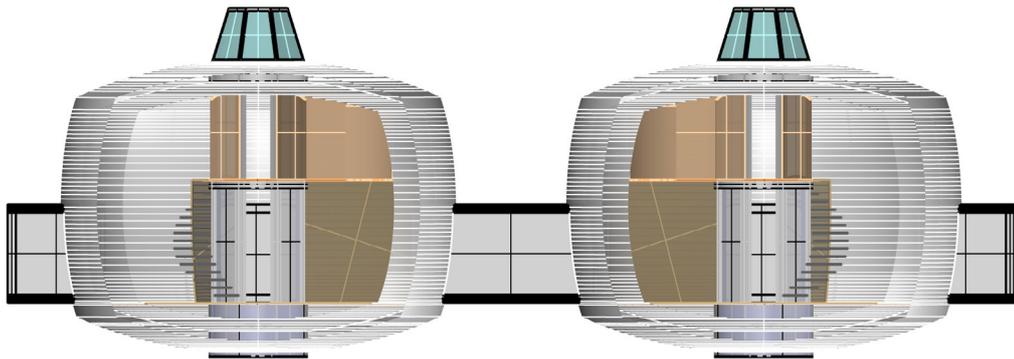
Extrude rolled up interior separation walls from central module
